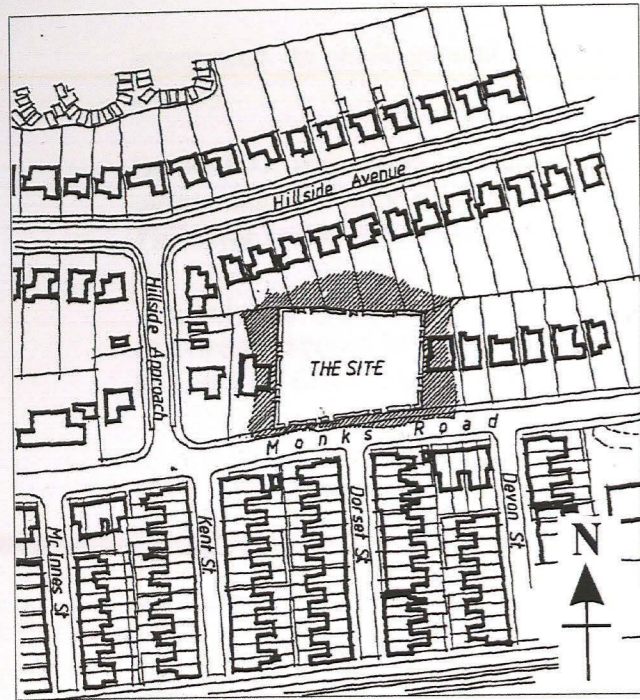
Site location plan. Based on developer drawings. Scale 1:2500
